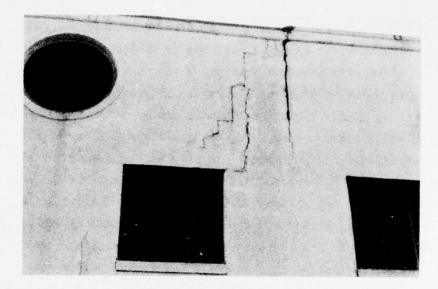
Examples of wall fractures from swelling foundation soils (after References 6, 30, 31)
